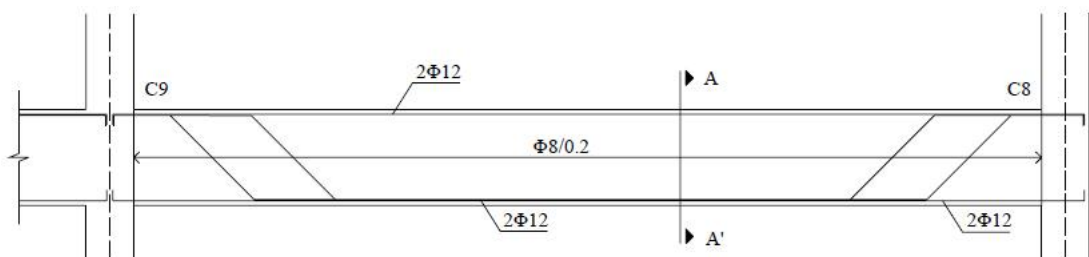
Reinforcement layout for a typical beam (units are in mm) [32].
